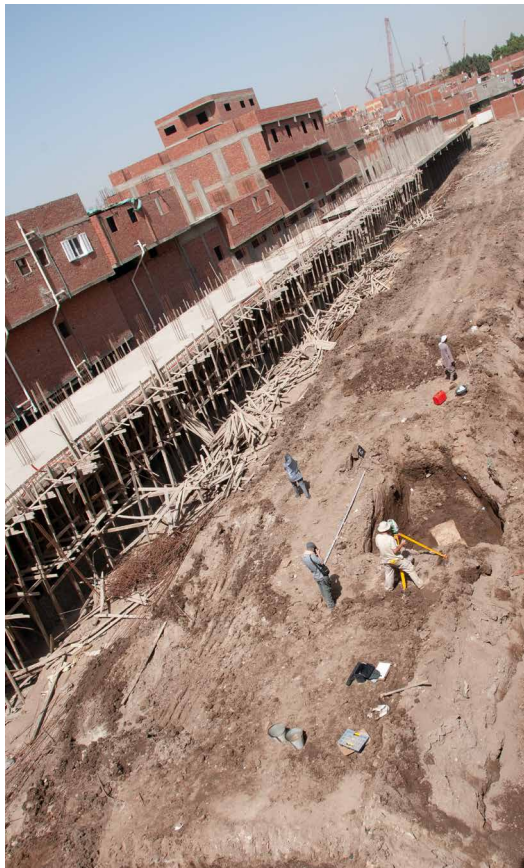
Excavation in Area 202 (spring 2016); view of residential houses (Photo: D. Raue).
